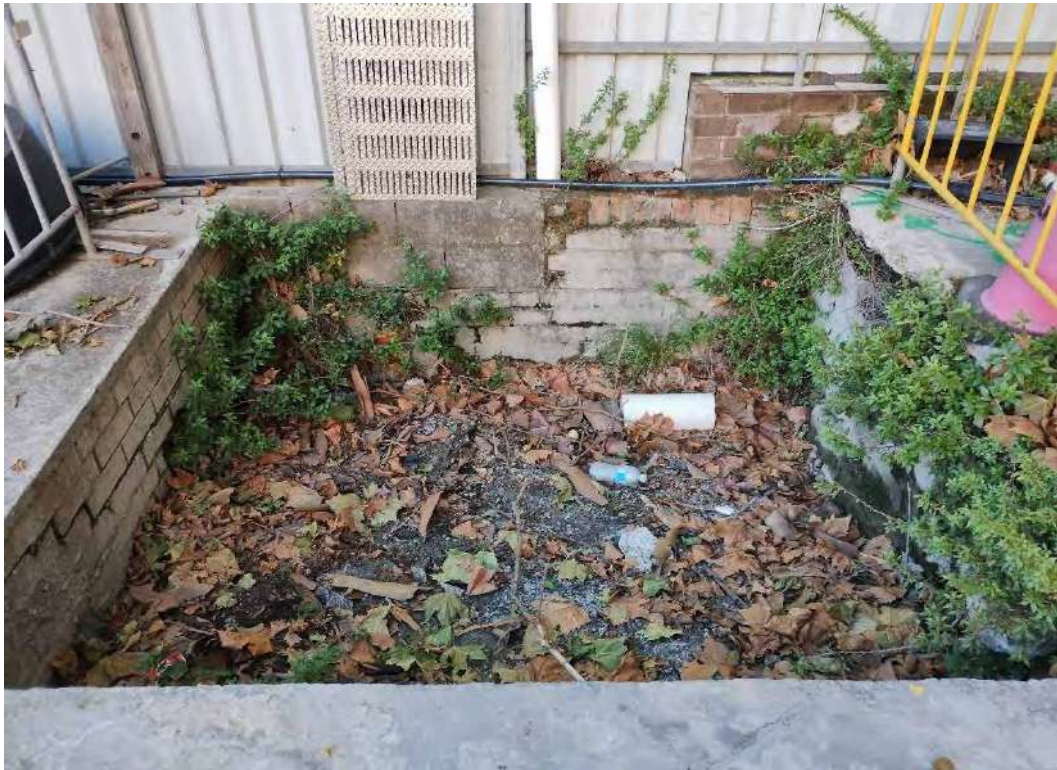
Pit located in the south- east corner of the site understood to be used to collect wash down water pending off-site disposal
